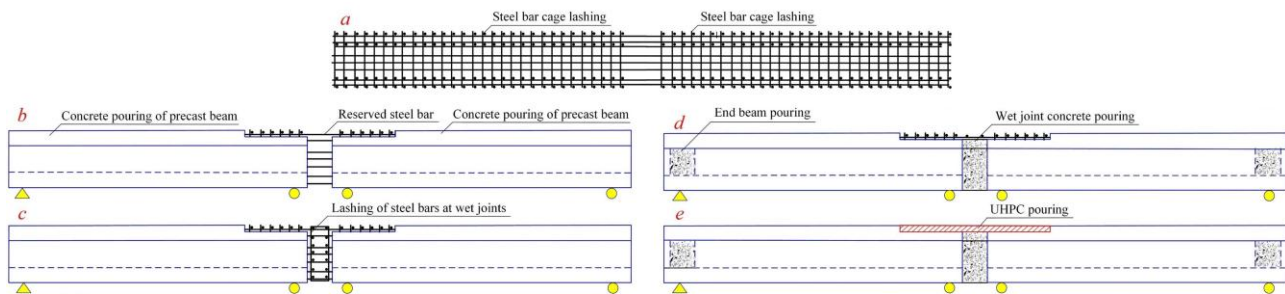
Schematic diagram of UHPC reinforced simply-supported to continuous concrete box beams in negative moment zone: (a) – precast beams reinforcement cage tying; (b) – precast beams concrete pouring; (c) – wet joints reinforcement tying; (d) – wet joints and end beams concrete pouring; (e) – UHPC pouring.
